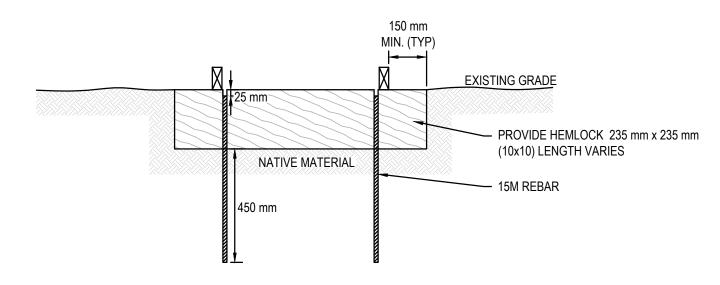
STAIRCASE GUARD DETAIL EXISTING STAIRS
